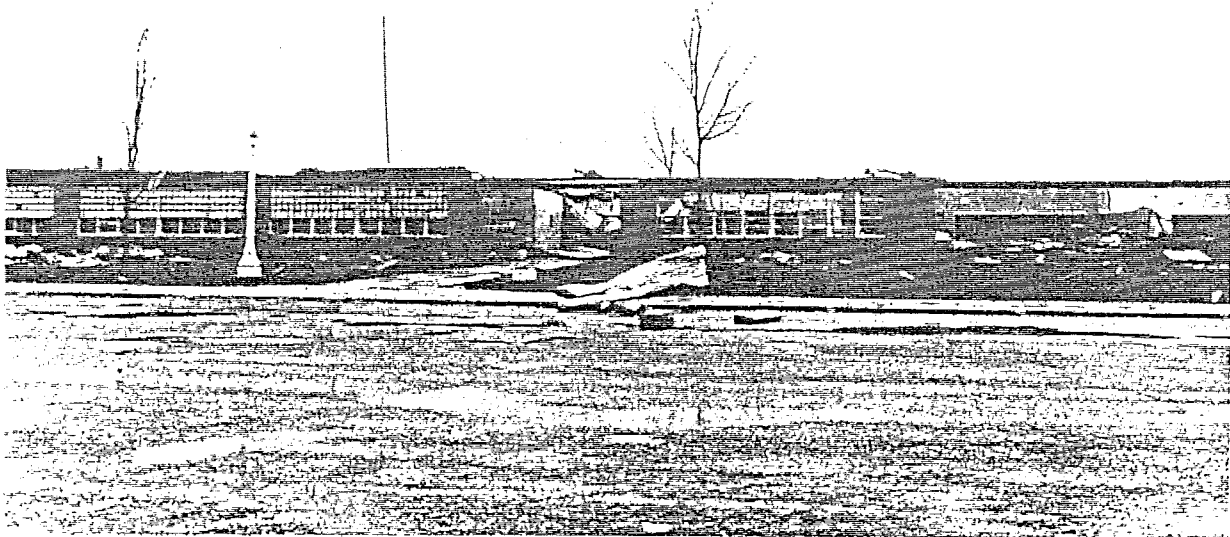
SIMON KENTON ELEMENTARY. Roofs over classroom and hallway were uplifted.
